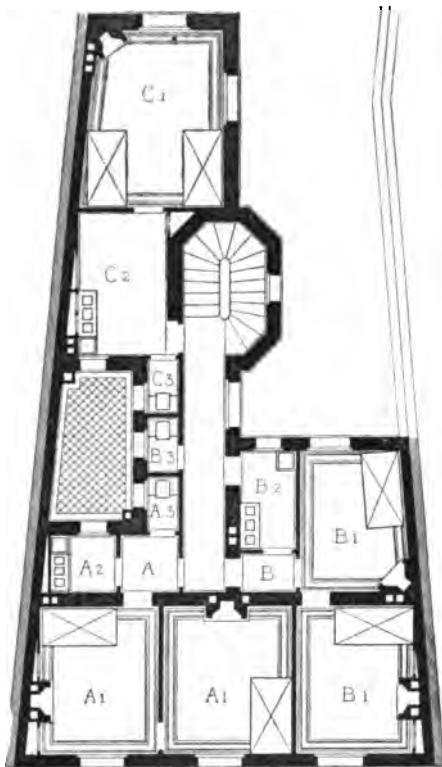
PLAN OF APARTMENT-HOUSE SHOWING THREE APARTMENTS, RUE DE BELLEVILLE, PARIS. M. HENEUX, ARCHITECT. (From *Architecture*.)
